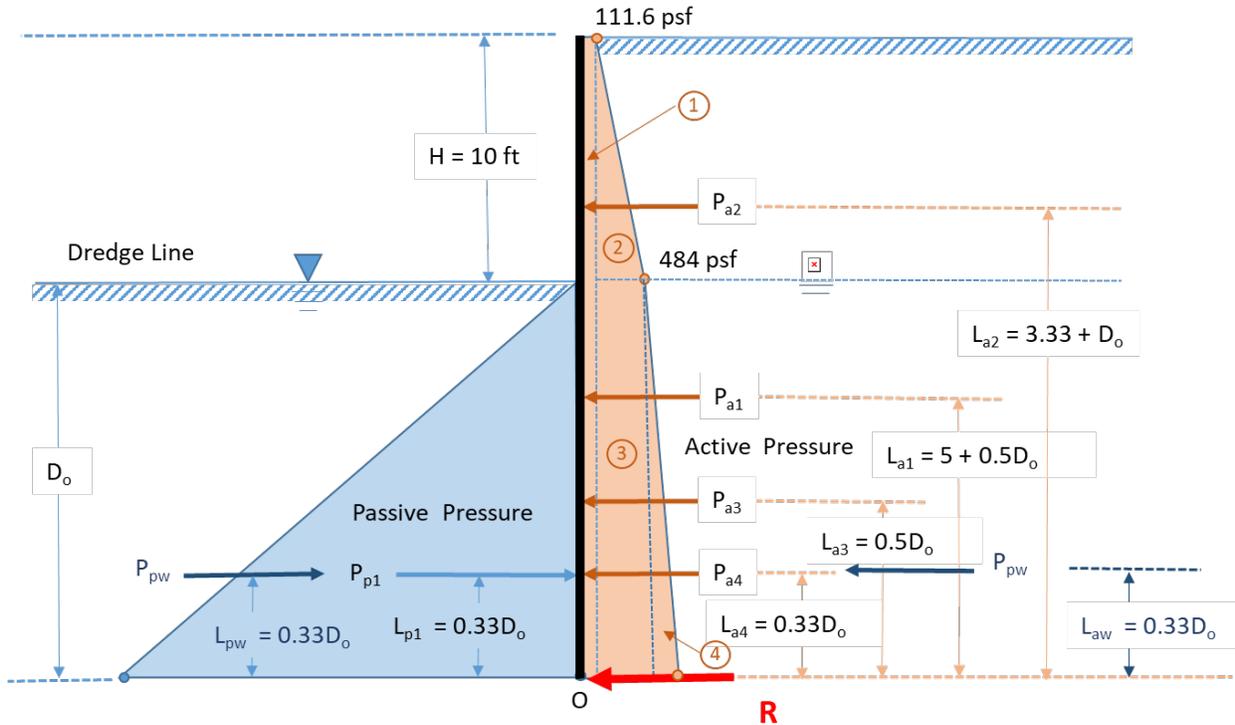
Case 1 Gross pressures, forces, and force locations acting on the sheet pile wall.
